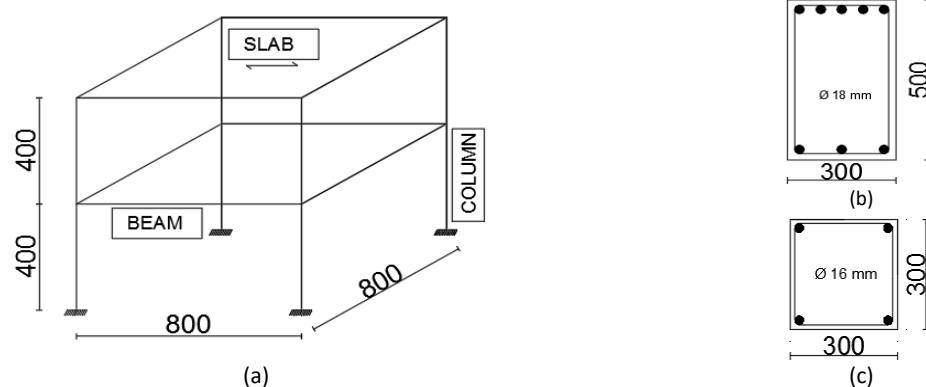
Analysed structure: a) model, b) cross section of beam, c) cross section of column.
